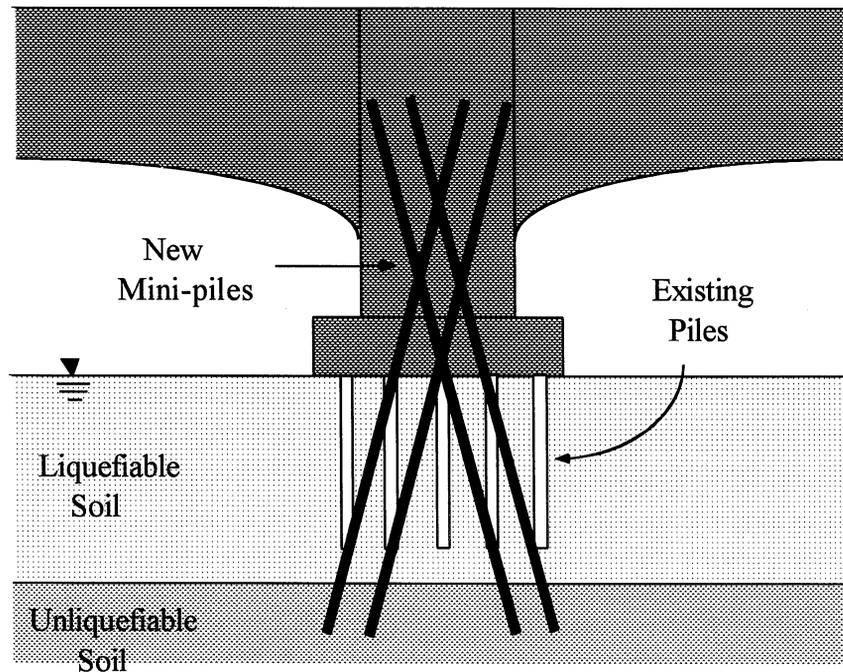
Conceptual Illustration of Foundation Improvement Using Mini-piles at Bridge Pier (after Hayward Baker Inc., 1995)
